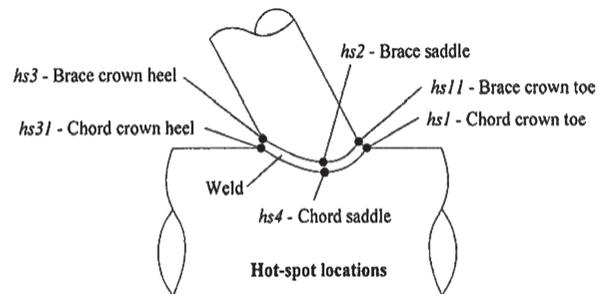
Definitions of hot-spot locations for a tubular connection (courtesy of Alain Nussbaumer).
